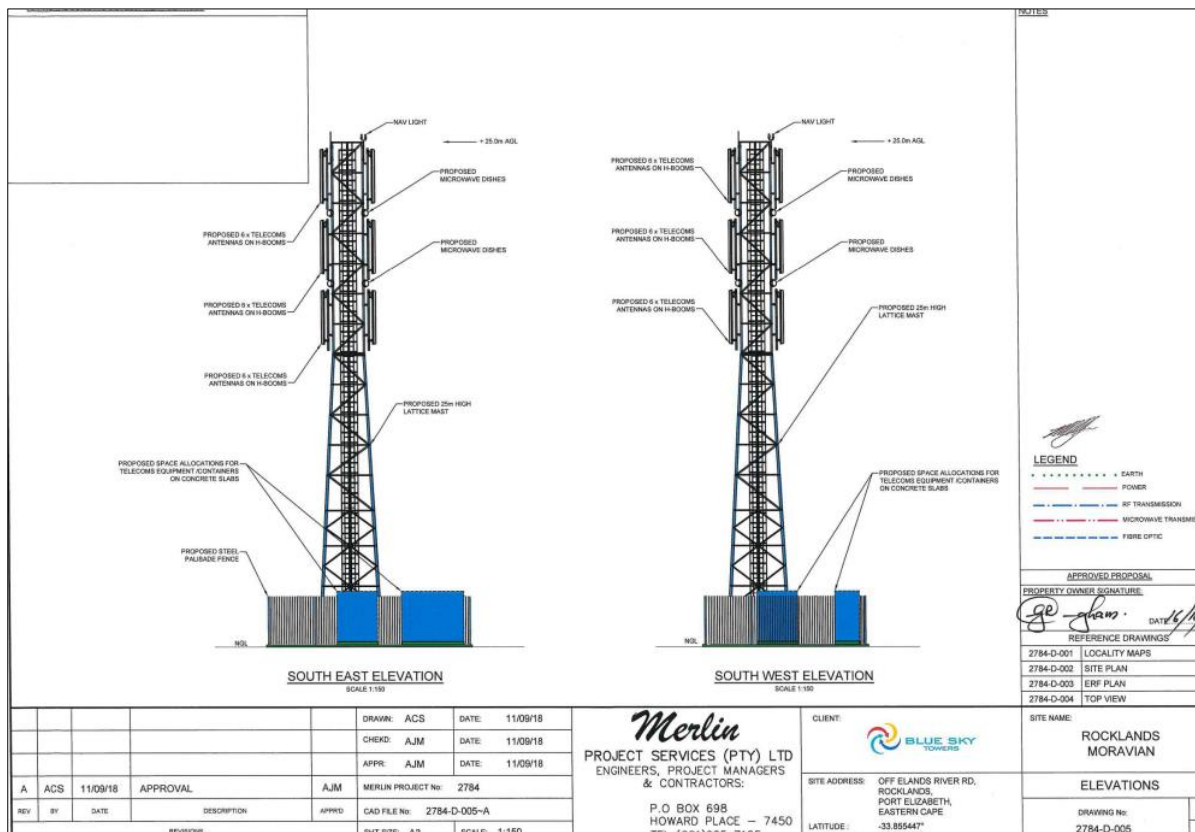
Elevation plan of the proposed Rocklands telecommunication mast
